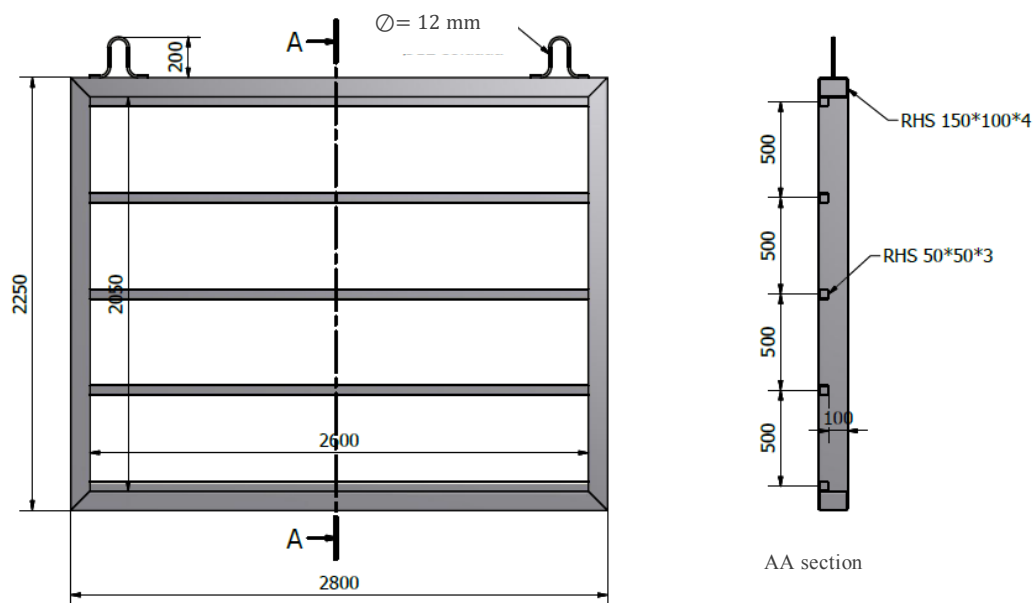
Front view of the metal frame and cross section AA (dimensions in mm).
